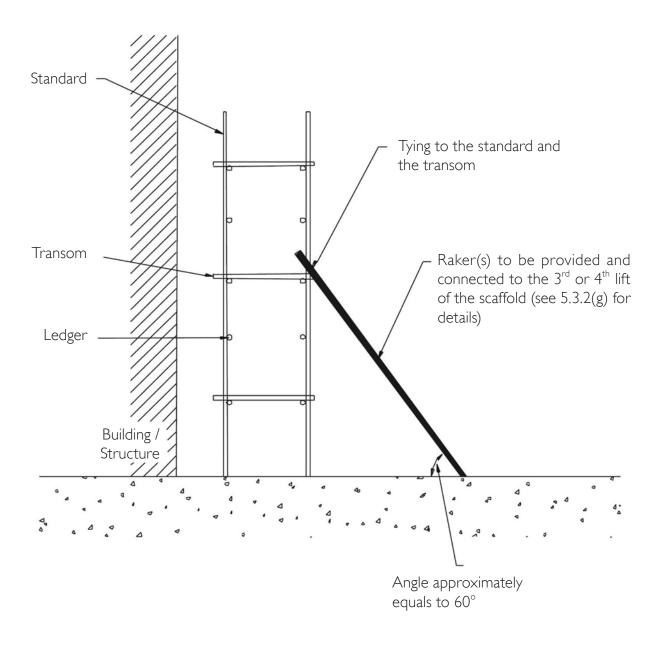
Showing the proper connection of bamboo members for bracings/rakers, ledgers, standards used in the erection of bamboo scaffold (not to scale)
